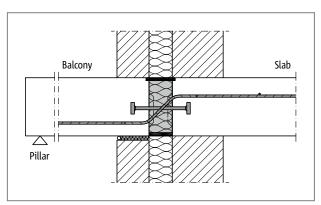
Schöck Isokorb® T type Q-P: Connection supported balcony with thermal insulating cavity masonry
